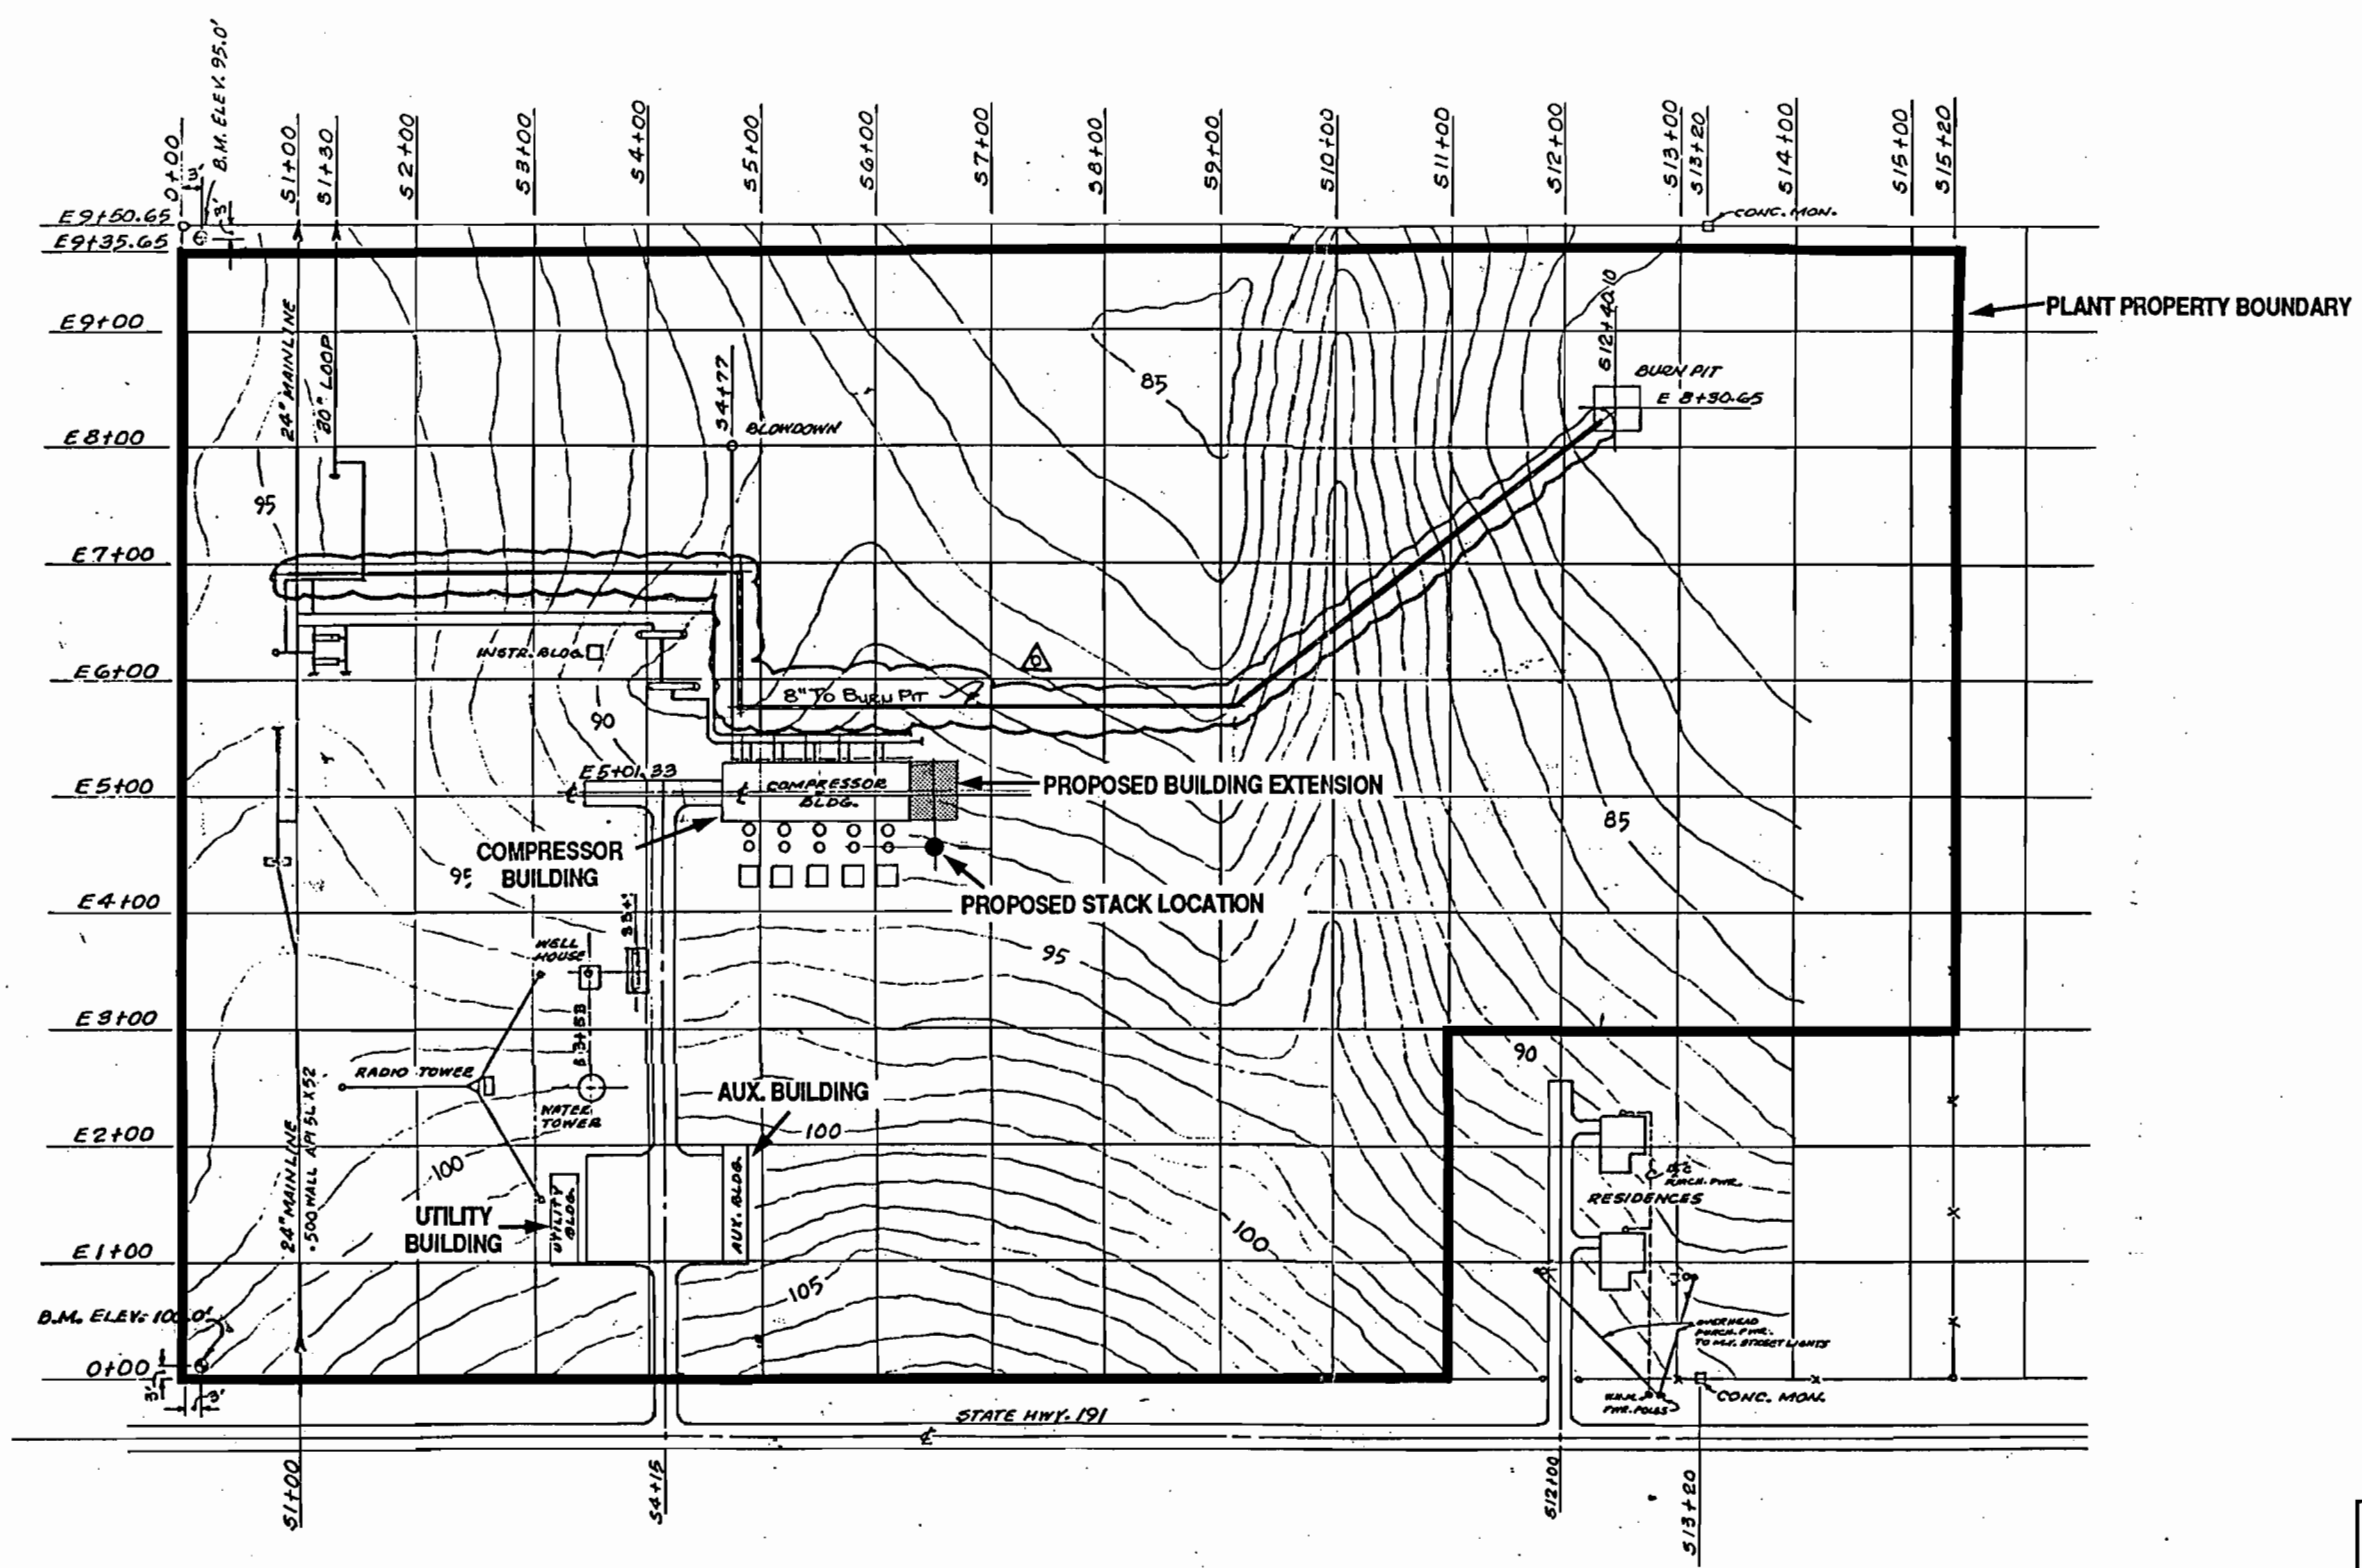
PLOT PLAN OF COMPRESSOR STATION NO. 12
